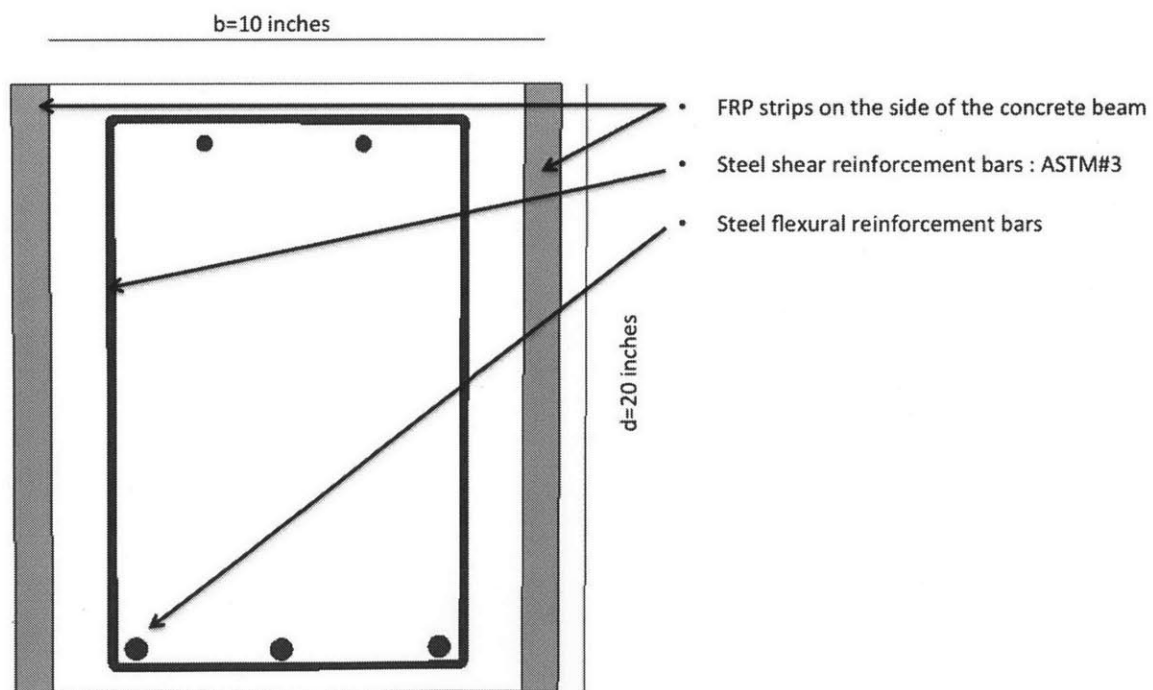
Details of the concrete beam taken as example and wrapping of the FRP strips
